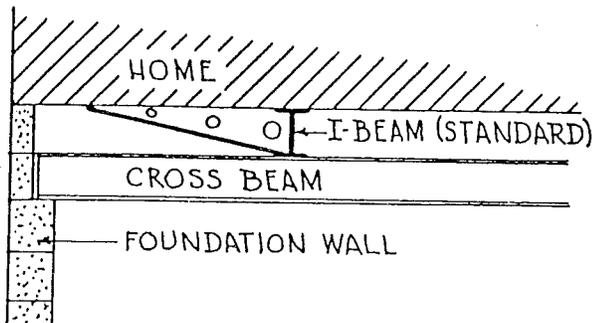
The I-beams of a standard frame rest on cross beams set into the foundation walls.
